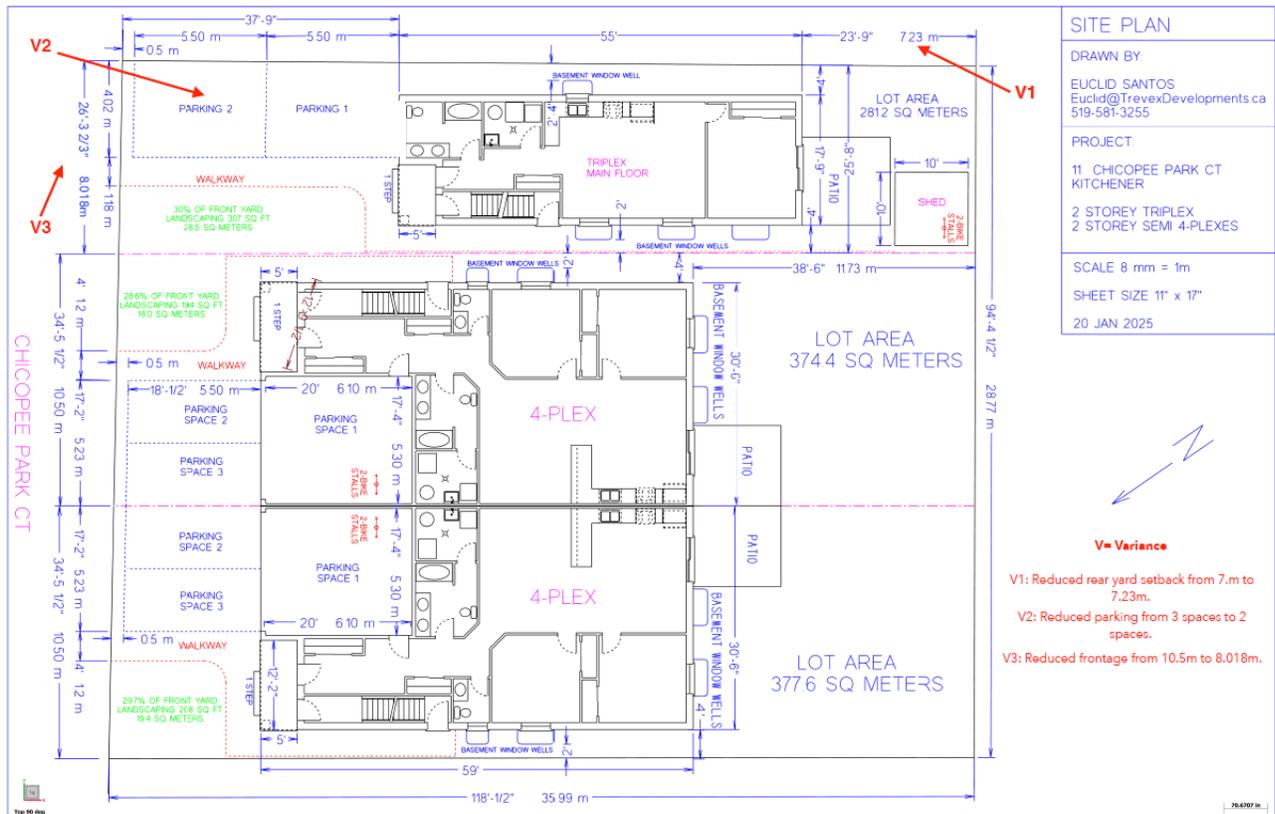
Proposed Semi and Single Detached Dwelling Location Plan
